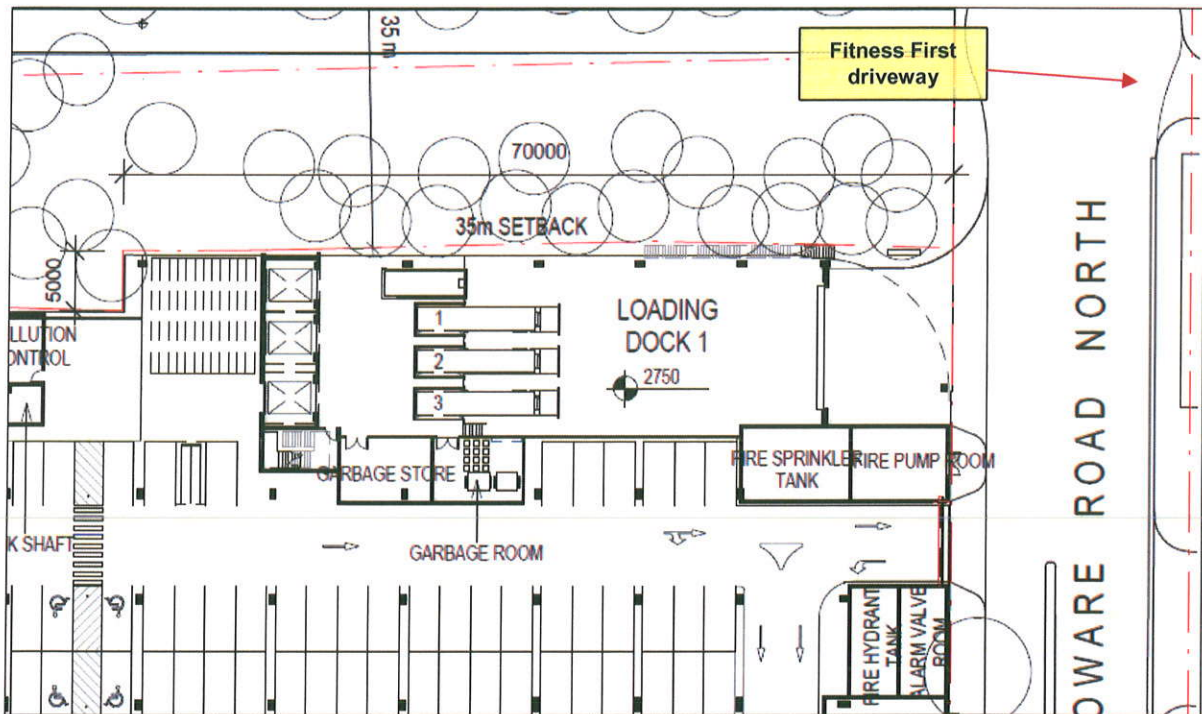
Loading dock servicing the retail centre (Source: Proponent's PPR / RtS)
